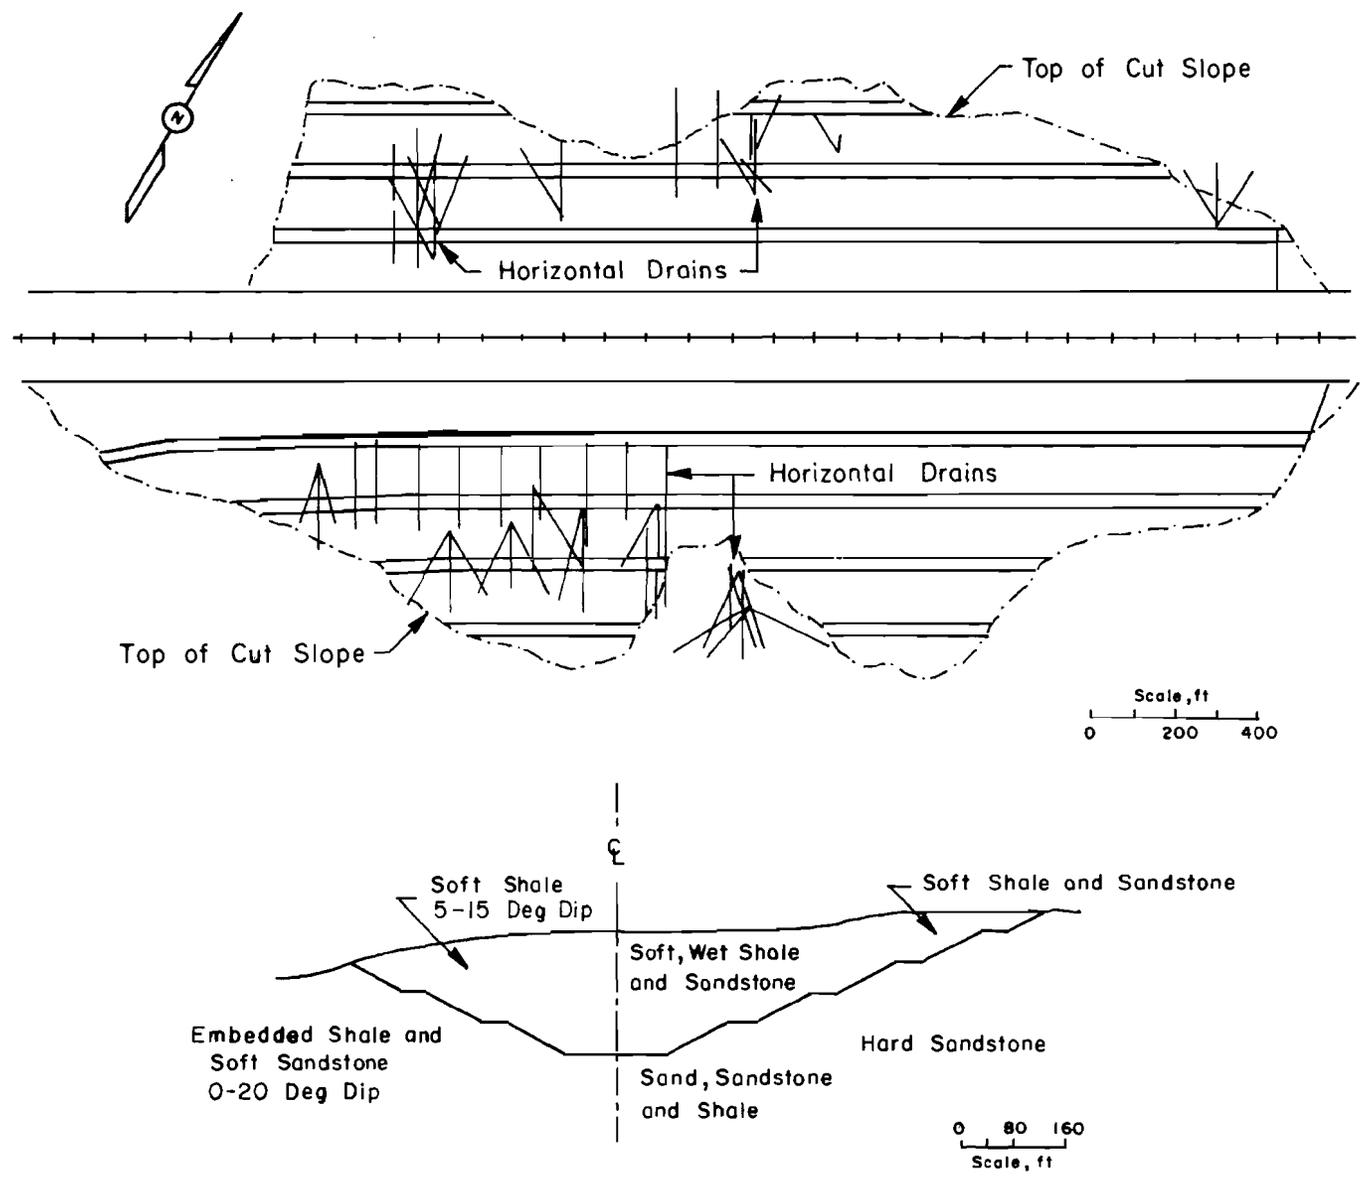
Combined benching and drainage for slope stabilization - Carquinez "Big Cut" (Cedergren, 1962).
